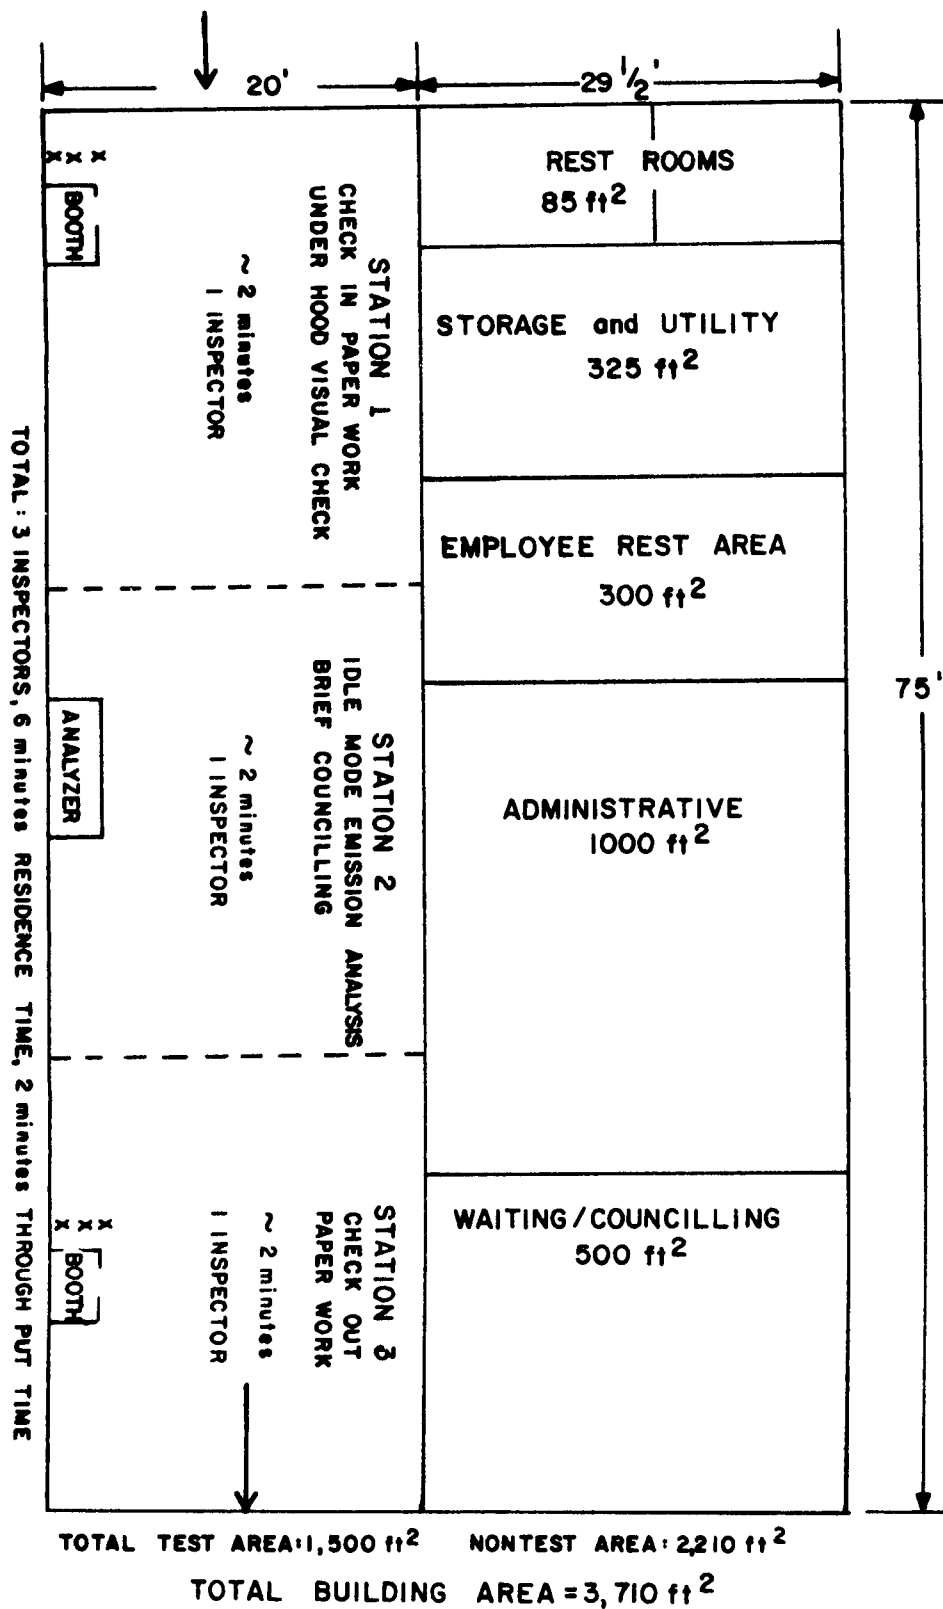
Conceptual floor plan for an idle mode inspection facility.
